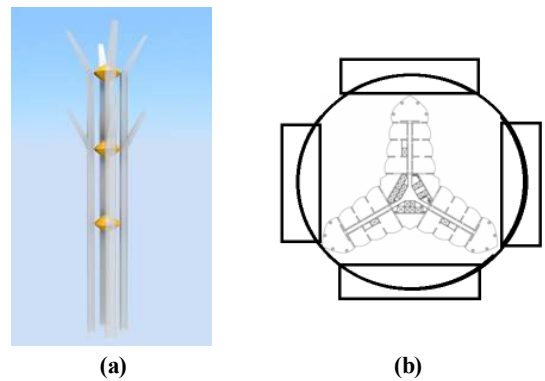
(a) Side View of the Proposed Hybrid Tall Building System Subjected to Wind Pressure, (b) Proposed Pan Compared with the Plan of Burj Dubai Building
